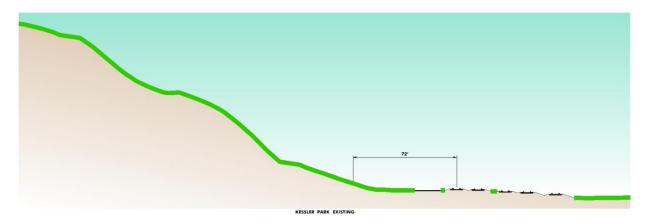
Regional Rail Typical Section on Common Segment - East of Chestnut Avenue - Kessler Park Existing Conditions
